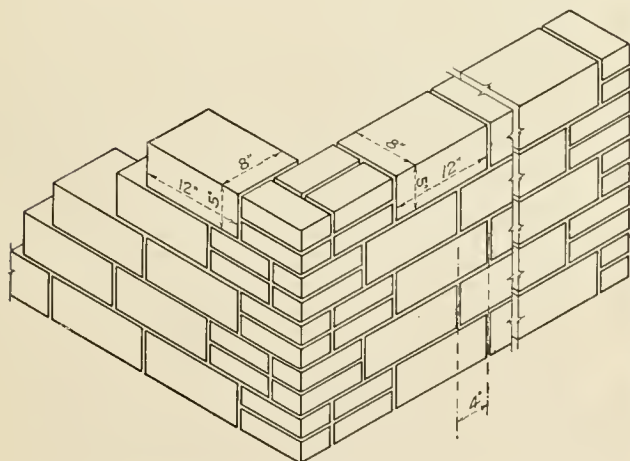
Bond on 8" side construction tile wall, using brick for corners and openings.
